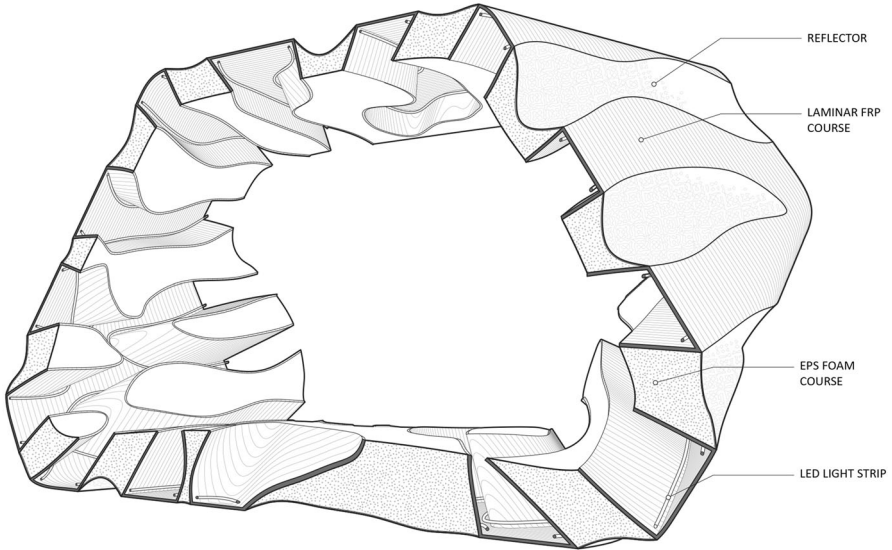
Cross-section of the *Plasticity Pavilion* schematic design
